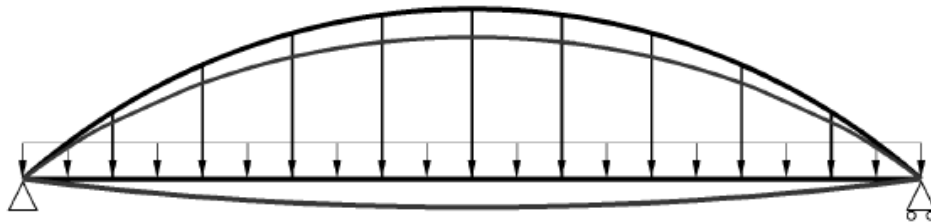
Uniformed Distributed Load - Arch Behavior of the Bowstring Bridge - (Gens F. , Design and Construction of Bridges - Chap 03b-2 - Bowstring Bridges, 2024)
